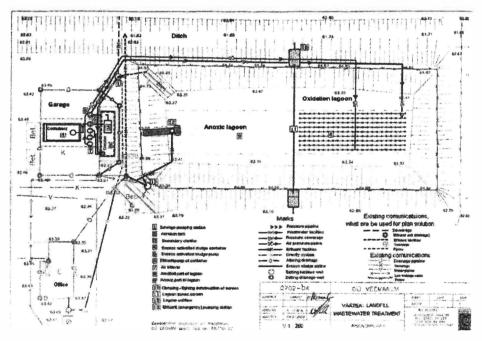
Situation plan of Väätsa Landfill Leachates Treatment Plant
